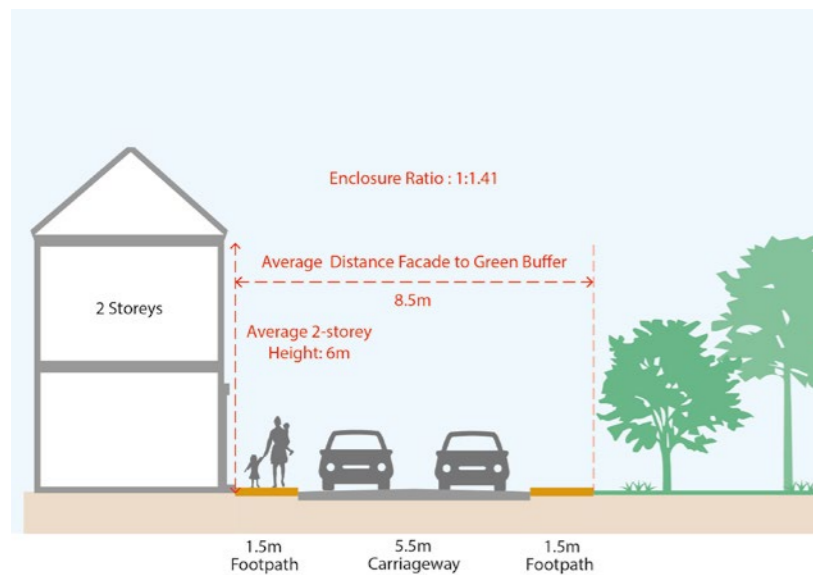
MIDDLEBRIDGE STREET SECTION
